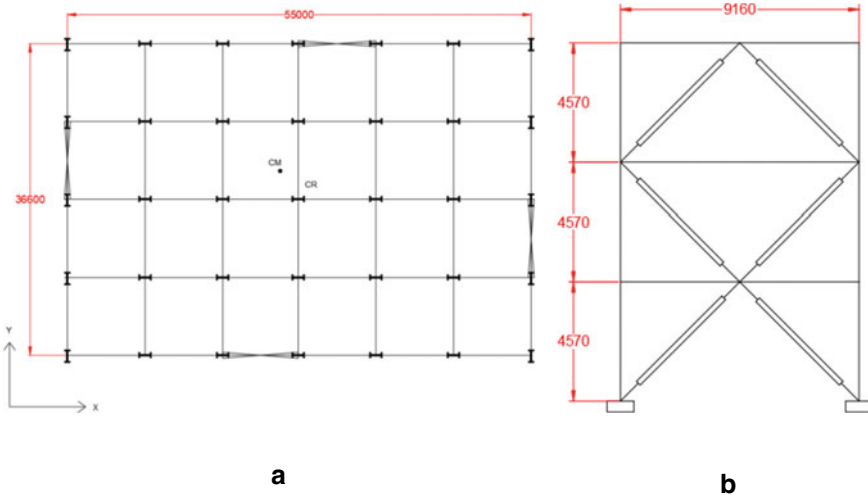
a Plan view of the building; b elevation (all dimensions in mm)
